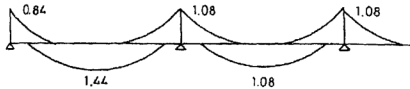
Filled Strip Moment/m (SHORT DIRⁿ)
